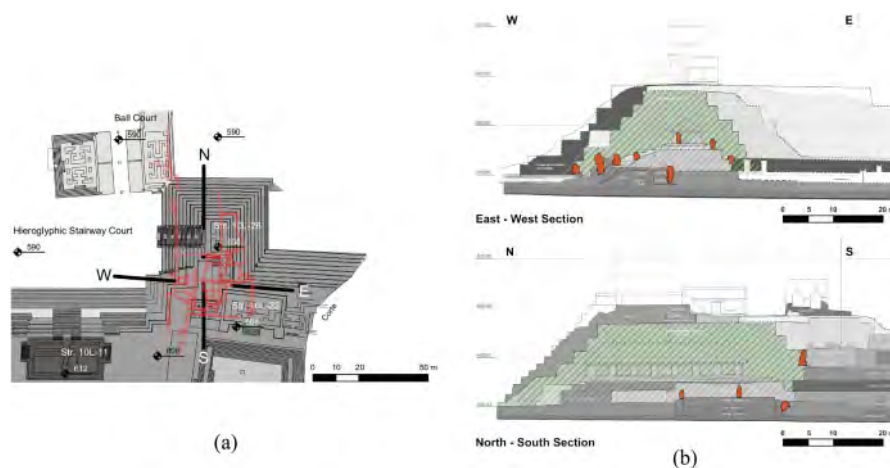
(a) Detail of the Acropolis plan showing the extension of currently open tunnels under the Hieroglyphic Stairway Temple (in red) – adapted from PAAC drawings; (b) Sections of the Hieroglyphic Stairway Temple showing the approximate positions of tunnels (in red) and the green hatch of the Esmeralda volume – adapted from C. Rudy Larios' PAAC drawings (modified after Pires *et al.*, 2021).
